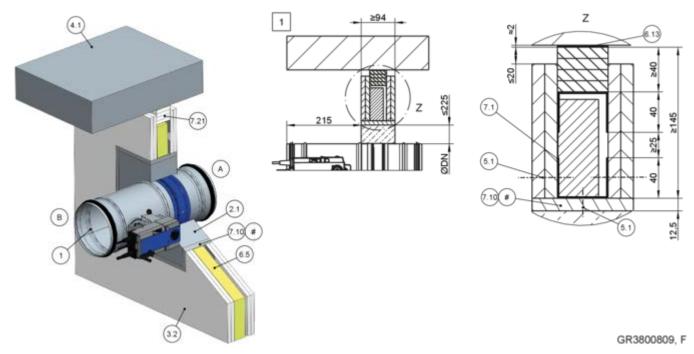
Mortar-based installation into a lightweight partition wall, below a flexible ceiling joint
